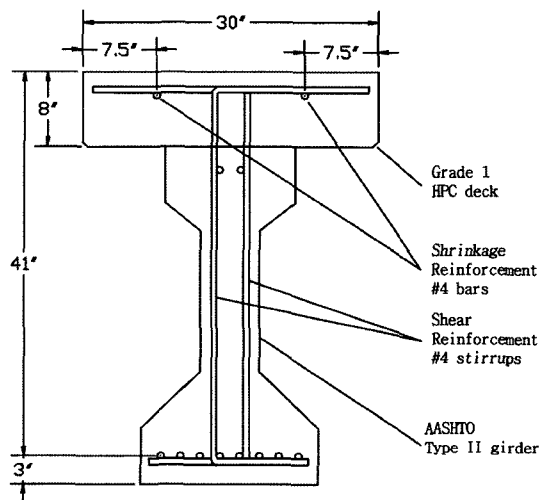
Typical cross-section of an AASHTO Type II girder and composite deck
